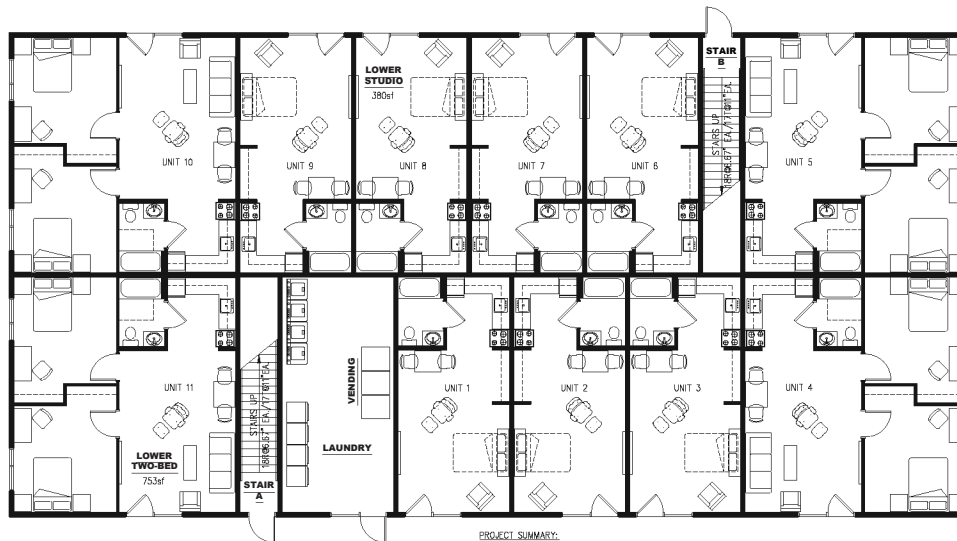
Staff Housing Expansion Apartment Floor Plan
